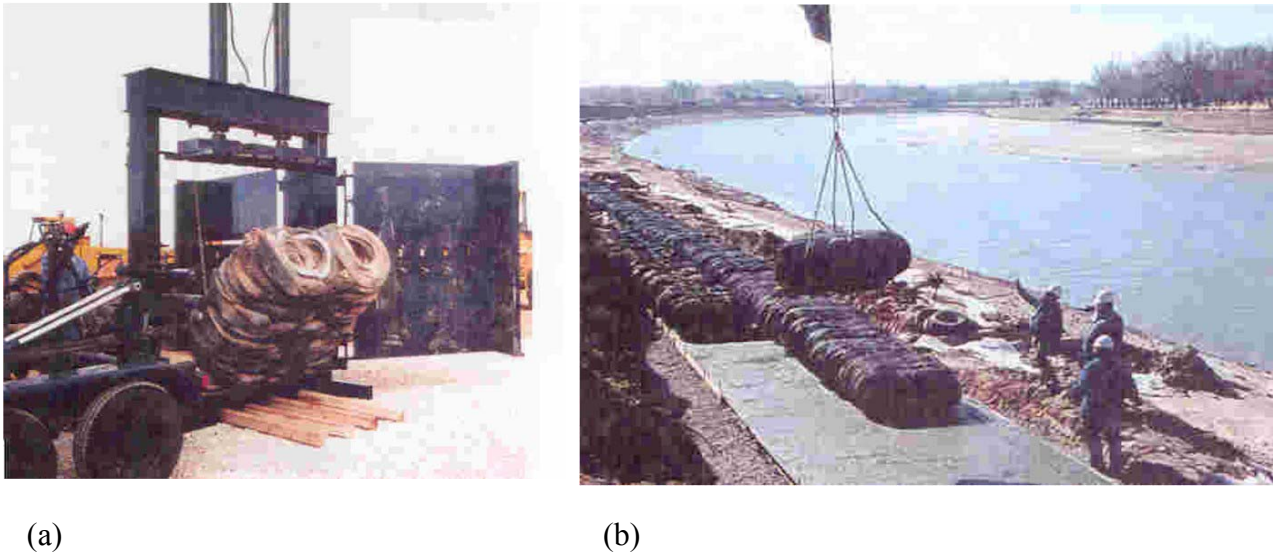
(a) A Hydraulic Tire Baler, and (b) Placement of Tire Bales (Courtesy of New Mexico Environment Department)
